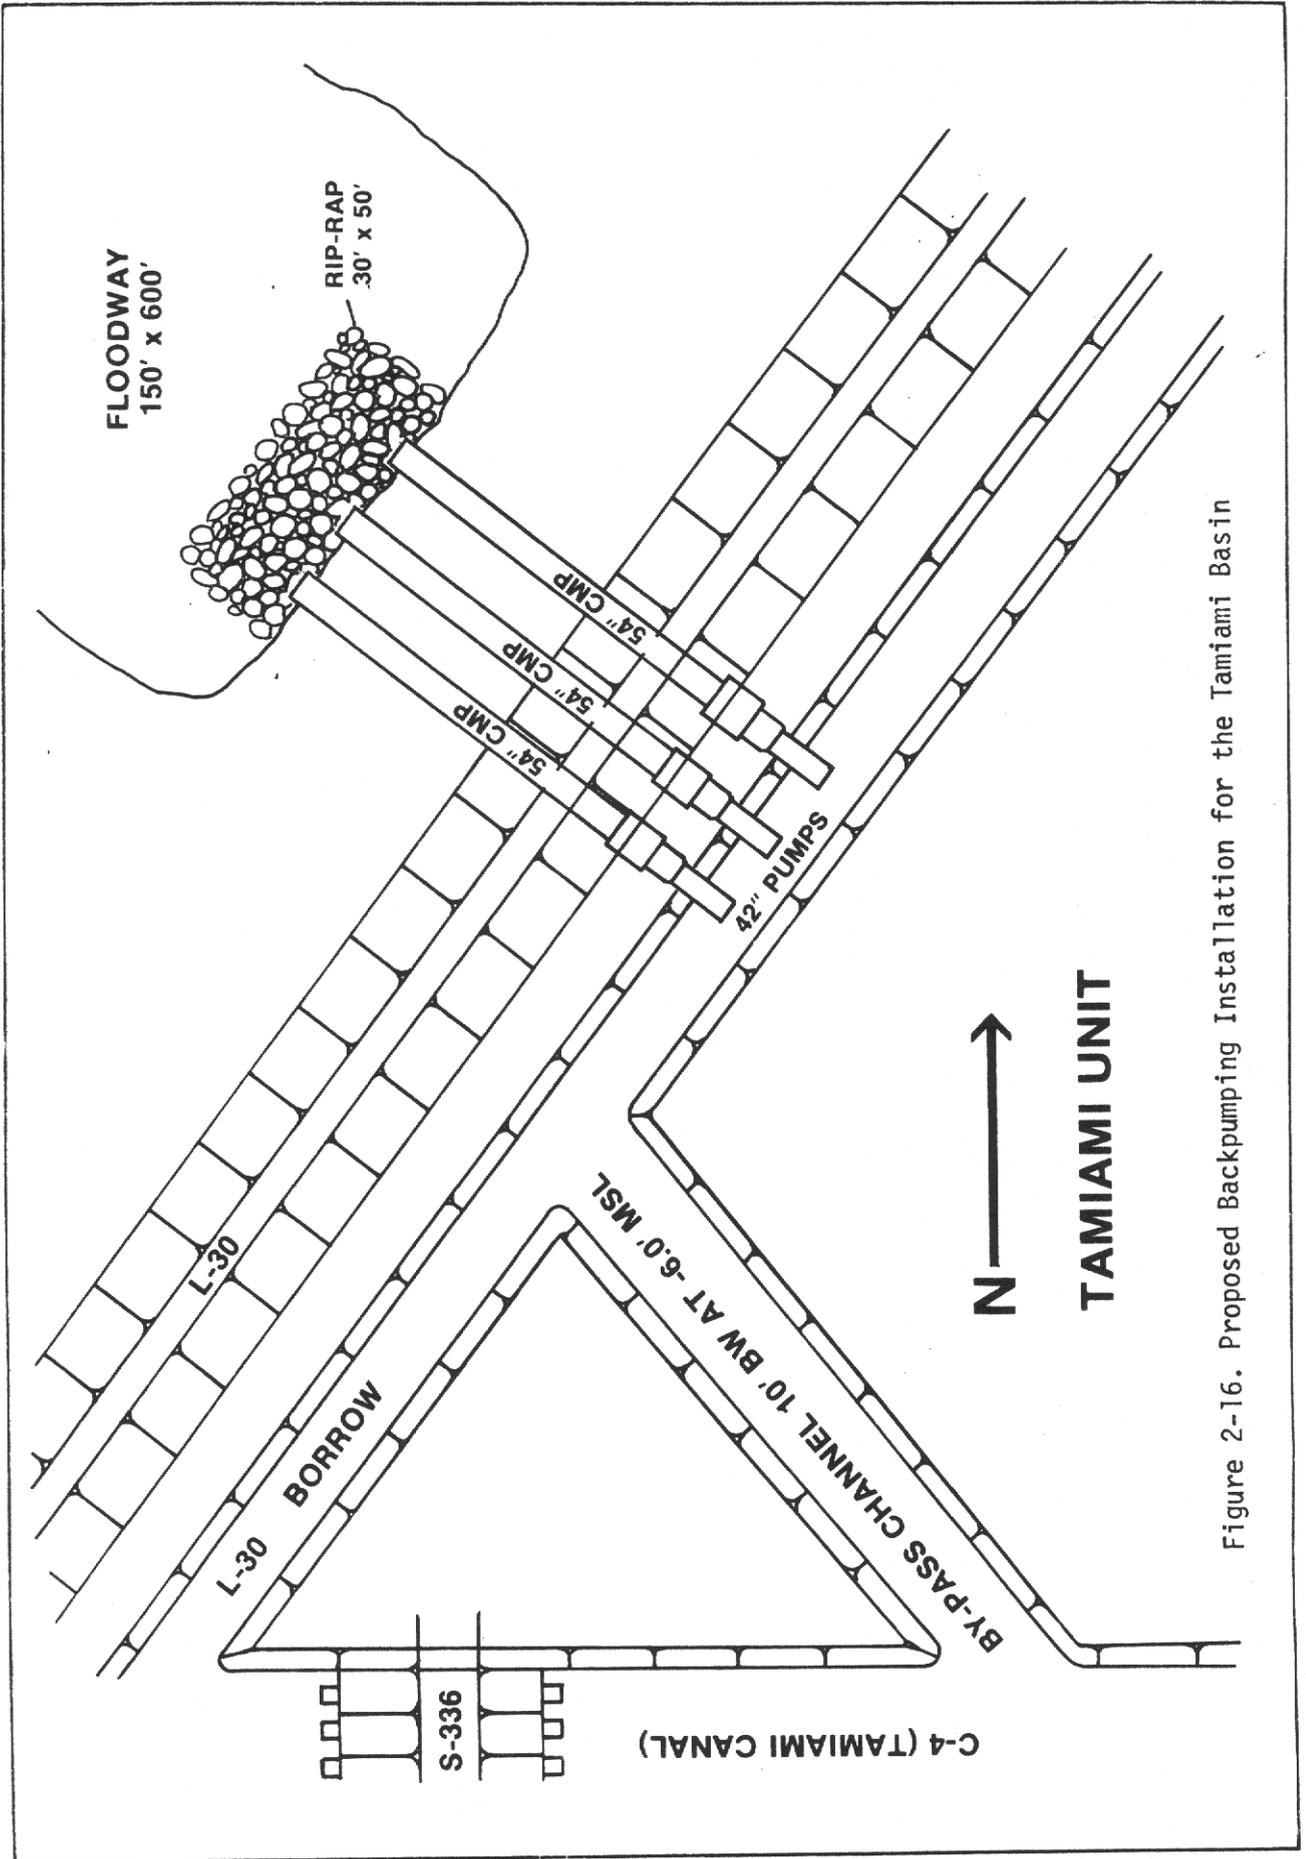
Proposed Backpumping Installation for the Tamiami Basin
